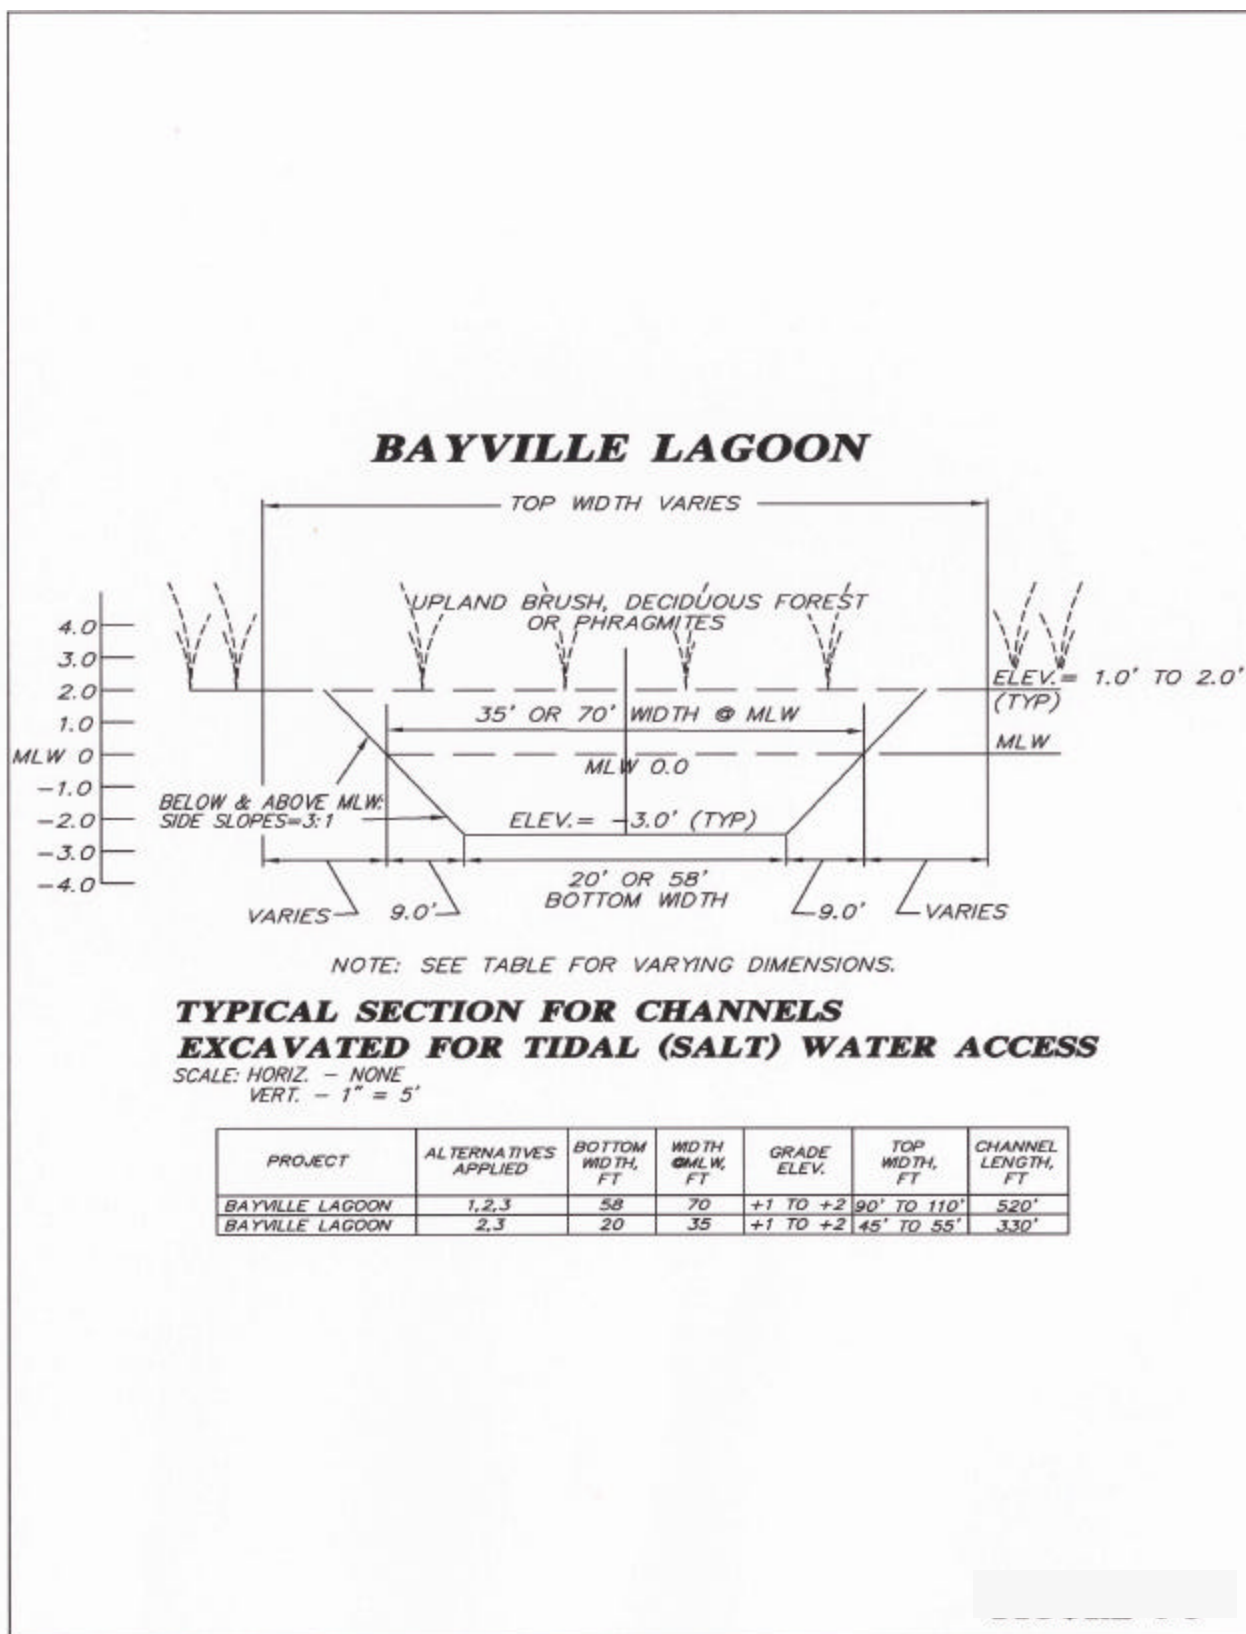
BAYVILLE LAGOON TYPICAL SECTION FOR CHANNELS EXCAVATED FOR TIDAL (SALT) WATER ACCESS
